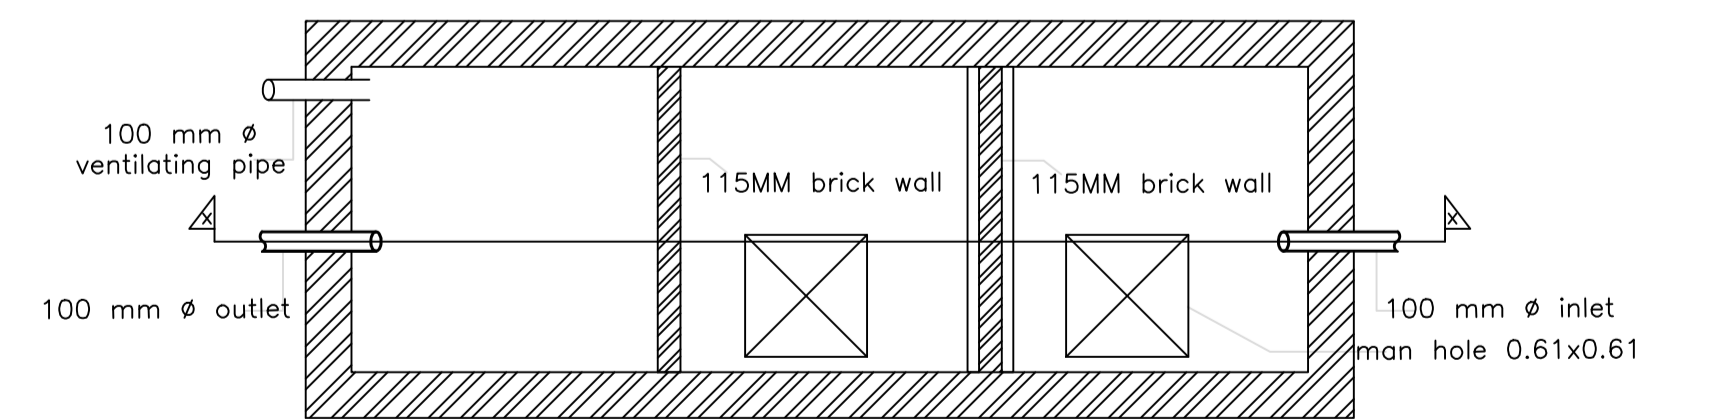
DETAIL OF GROUND WATER RECHARGING PIT WITH SILT TANK NOT TO SCALE
